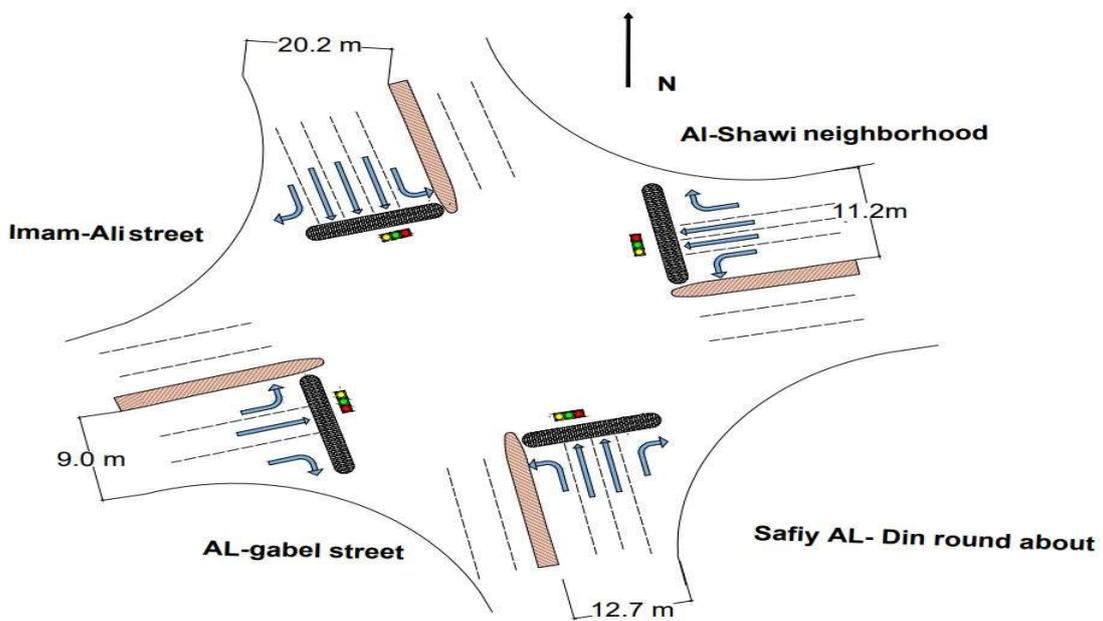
Improvement Proposal for Bab al-Mashhad Intersection.
